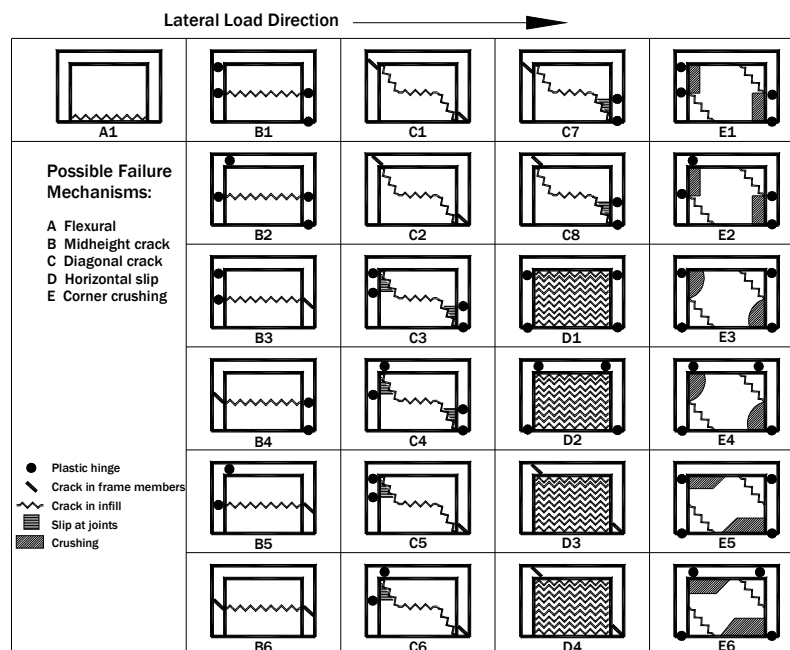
Failure mechanisms of infilled frames (Shing and Mehrabi, 2002).
